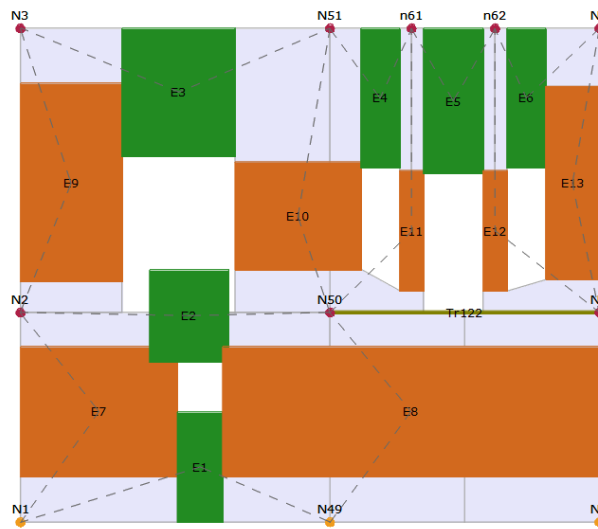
Elevation of wall in zaitoun building model use in 3Muri program.
